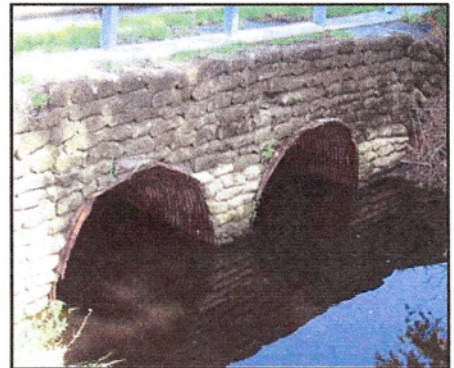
Deteriorated Metal Culverts (shown) were Replaced with Durable Concrete Culverts.
